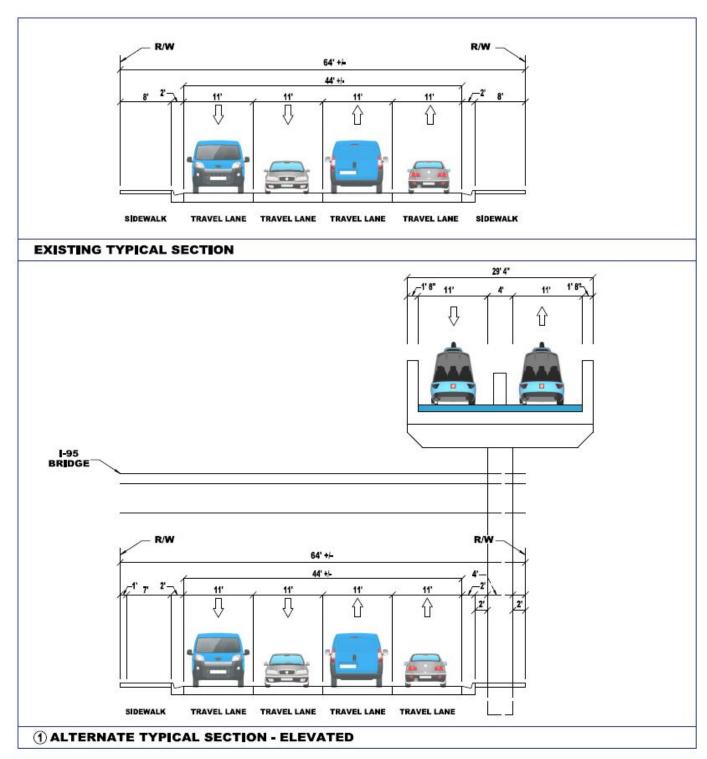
South Corridor Existing and Alternate Elevated Typical Section San Marco Blvd.
